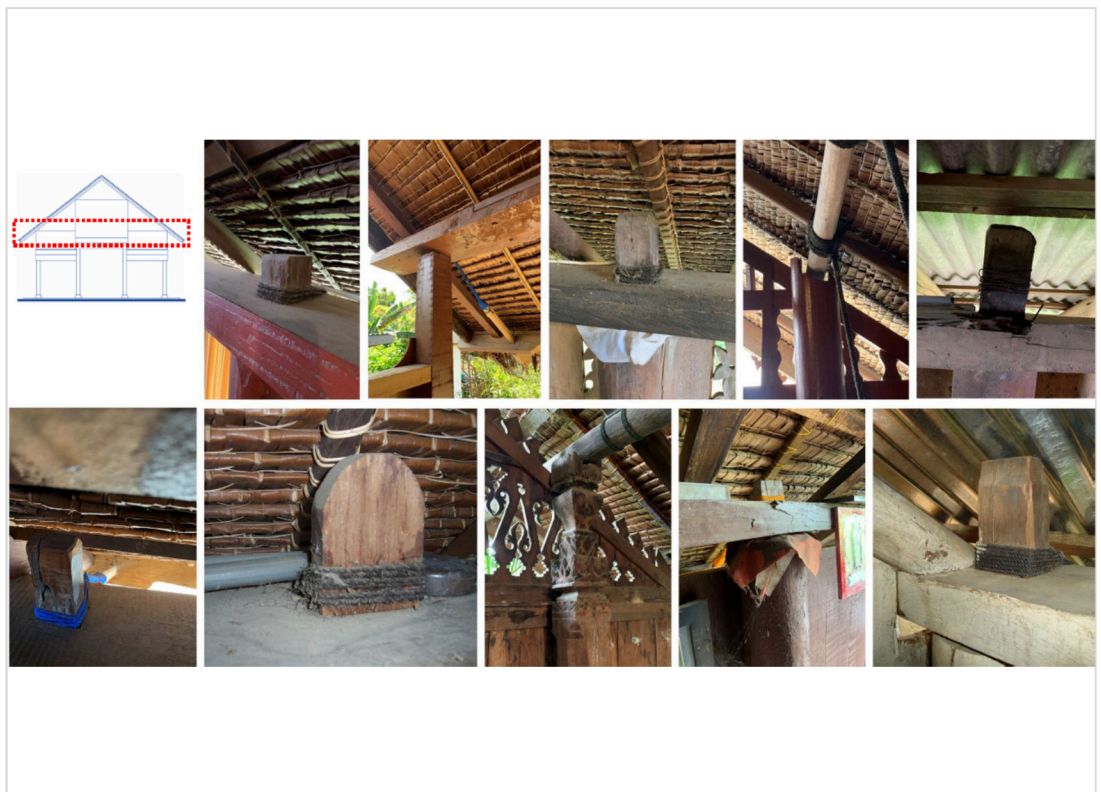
Documentation of beam and roof construction in *Rumoh Aceh
